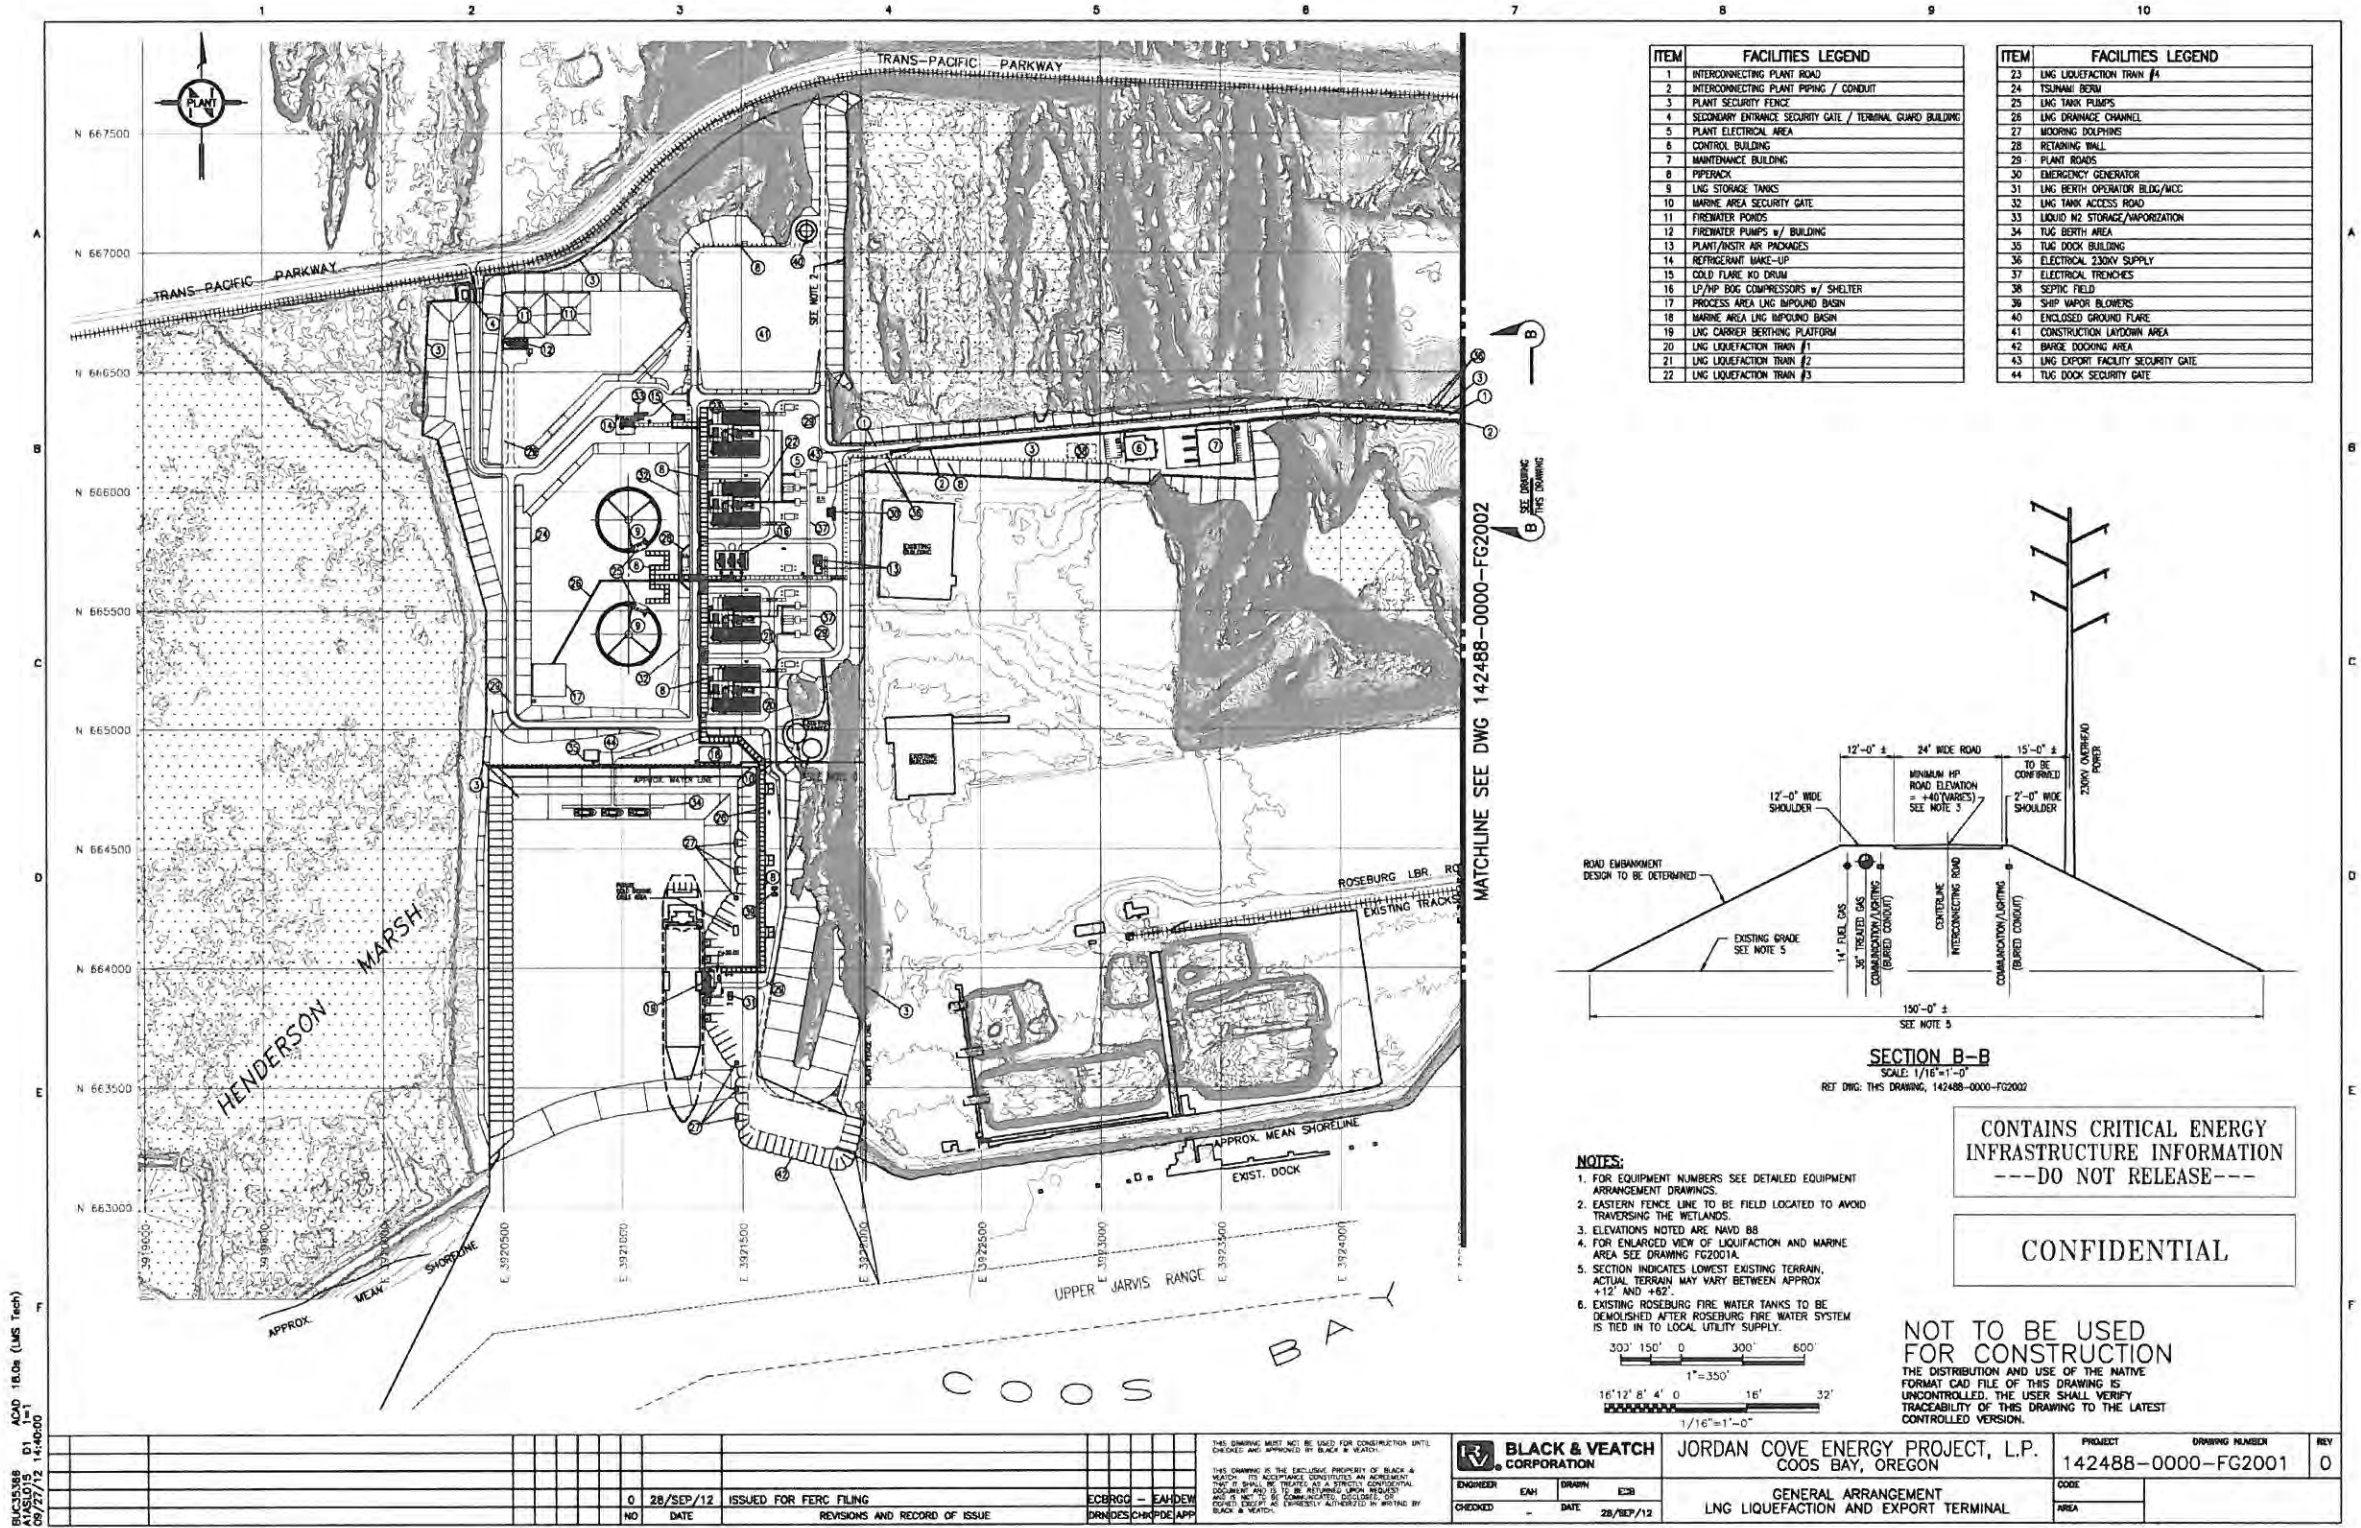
Facility Buildings and Stacks for Downwash Analysis
